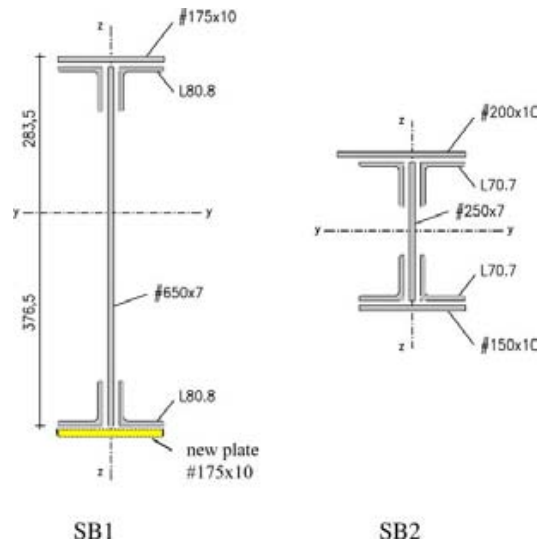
Cross sections of secondary beams (SB1 and SB2).
